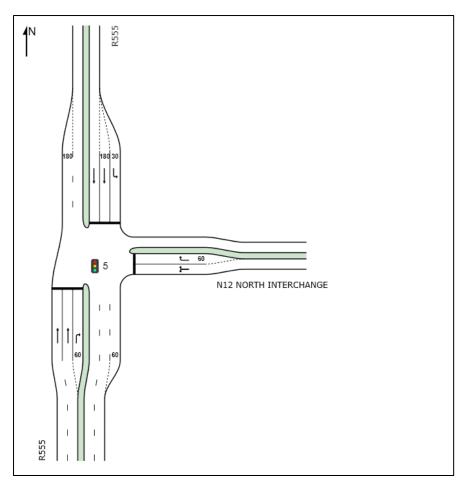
Intersection 5 Proposed Layout (2026 Background Traffic)
